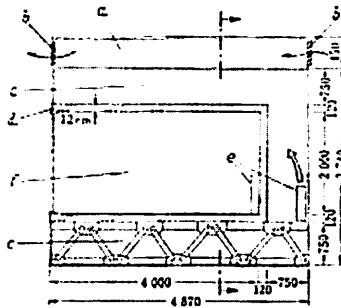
Transverse section of Japanese Calorimeter Test Room
